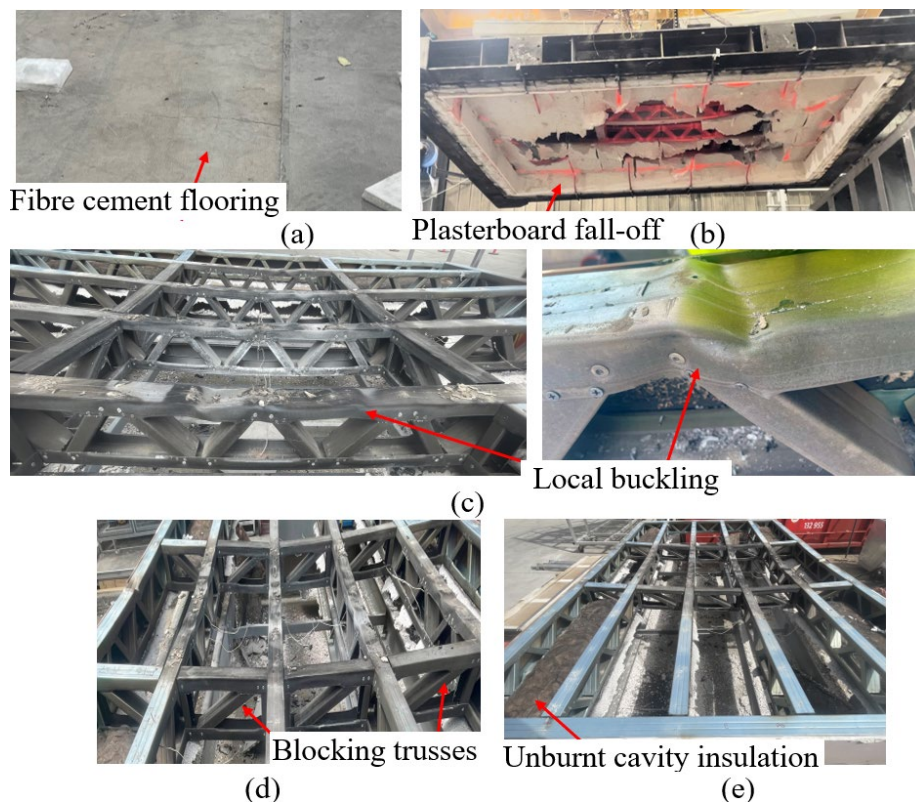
Post-test observations of Specimen FS1 (a) fibre cement board flooring intact with minor cracks (b) face and base layer fall-off (c) local buckling of main trusses (d) blocking trusses without any failure (e) post-test frame with unburnt cavity insulation
